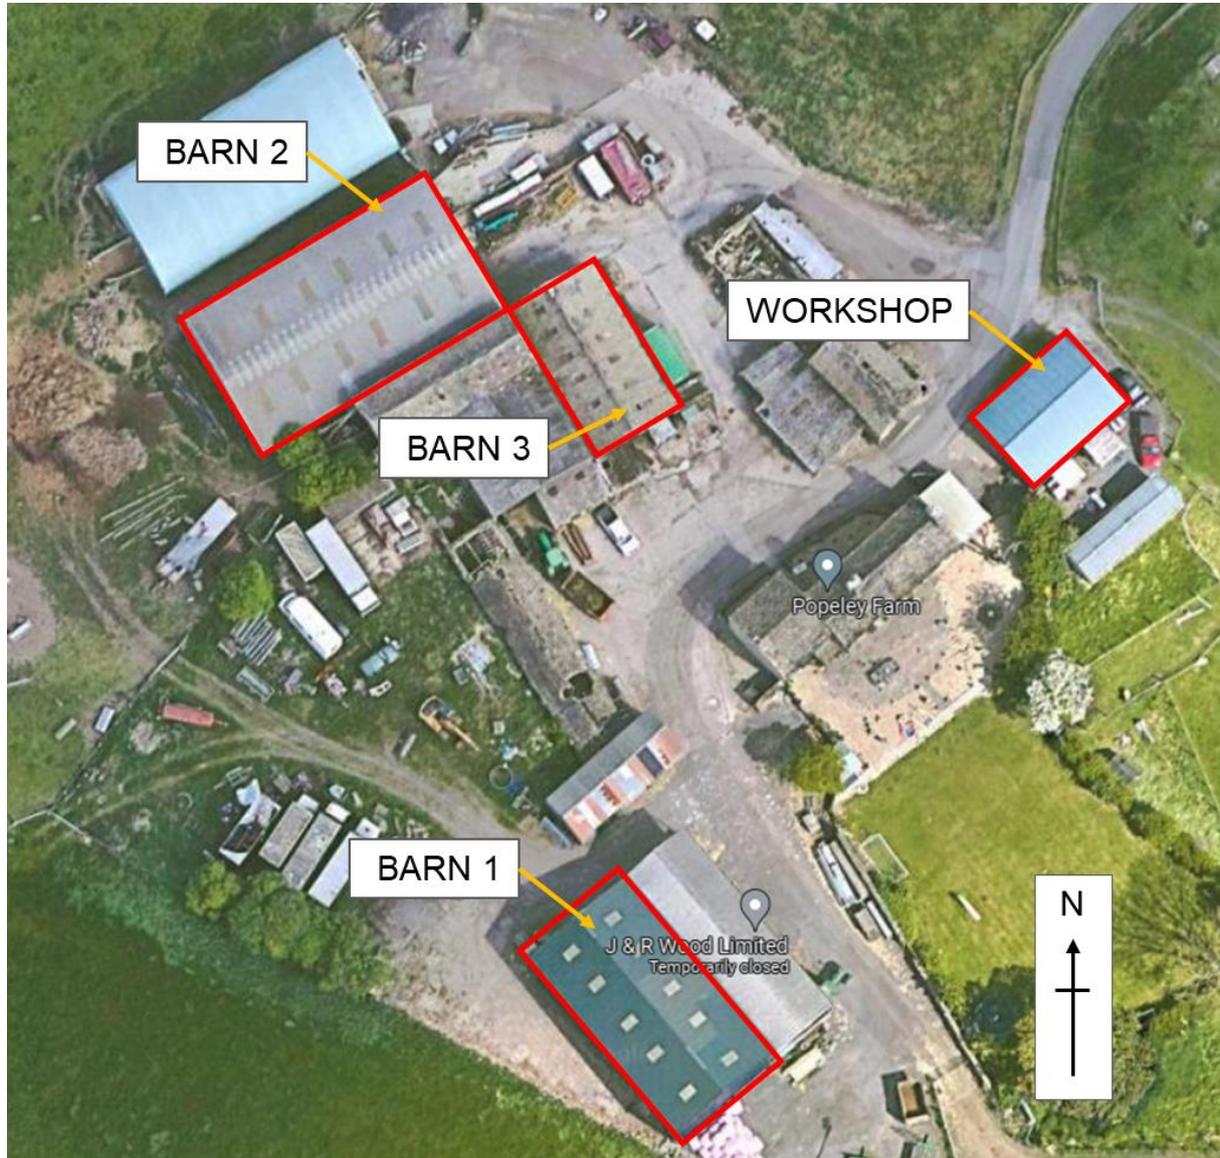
Site layout and nomenclature of the barn and workshop structures (base image credit: Google Earth Pro.)
